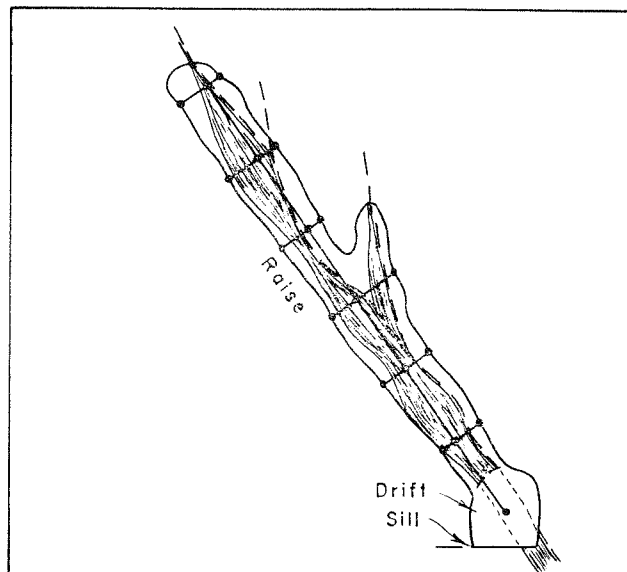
Vertical section showing geology in inclined raise.
